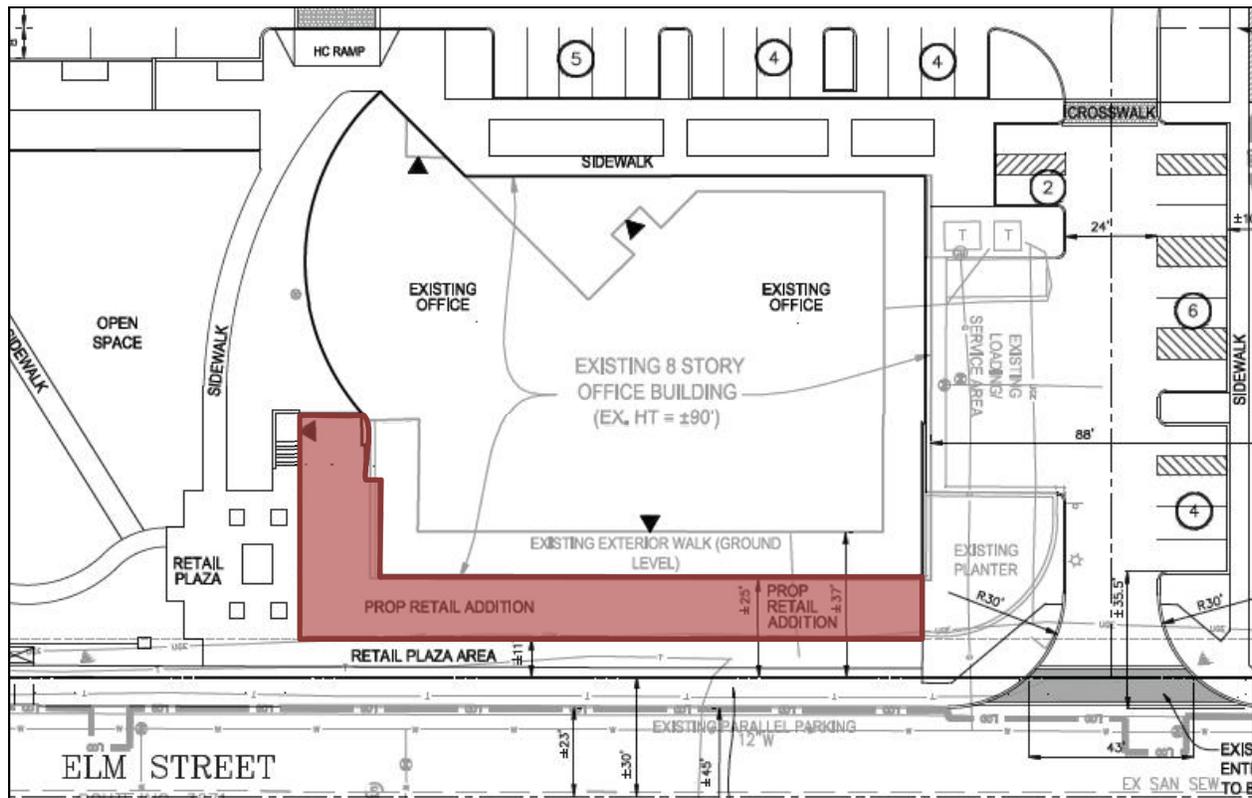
The proposed retail addition would extend beyond the current façade of the existing office building. The retail plaza is located just to the west of the office building (Source: Bowman Consulting, June 1, 2014)
